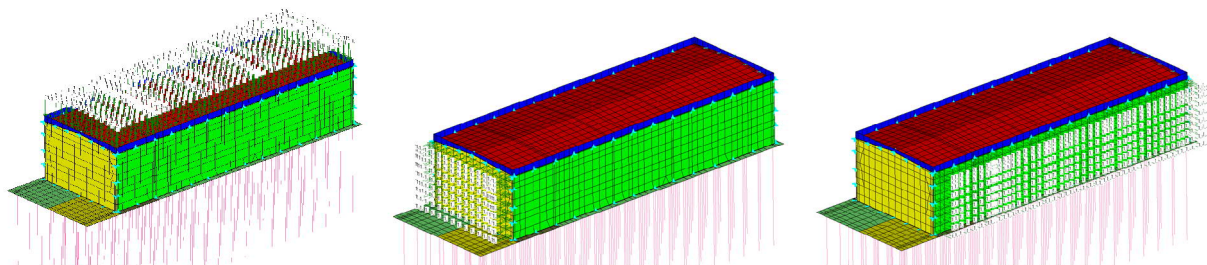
Application of blast loading: on roof (left), on wall (mid), on side wall (right)
